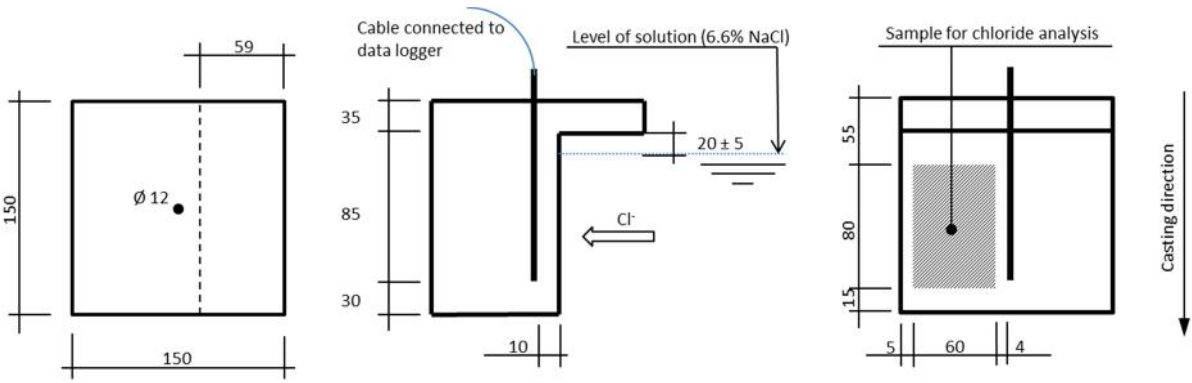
Concrete specimen with embedded steel bar (paper VII). The dimensions are given in mm.
